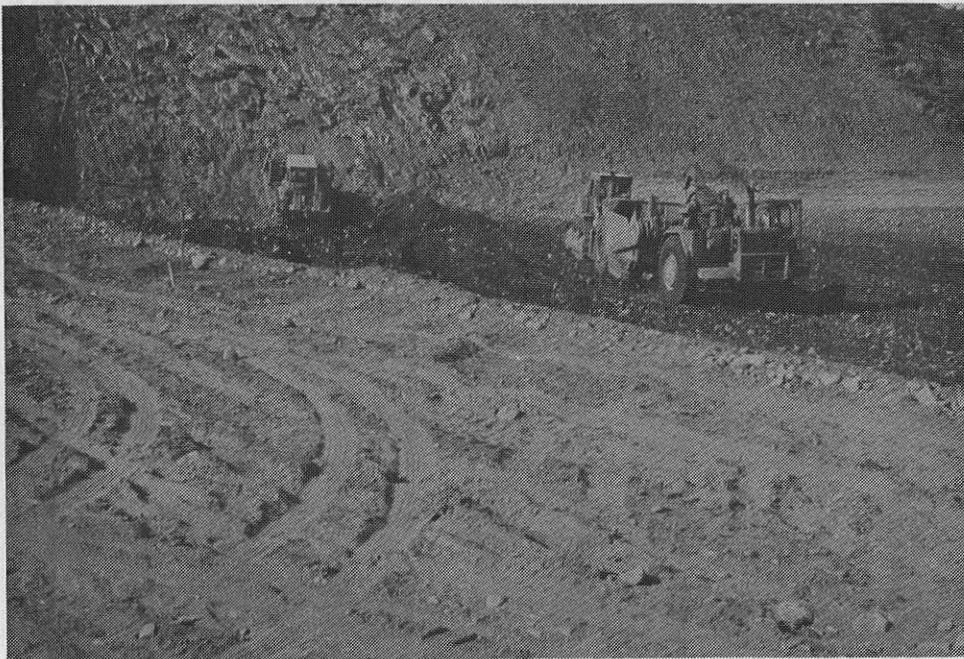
Core trench excavation using push cat and scaper. Note dozer using rippers and blade to excavate base of right abutment. December 1983
